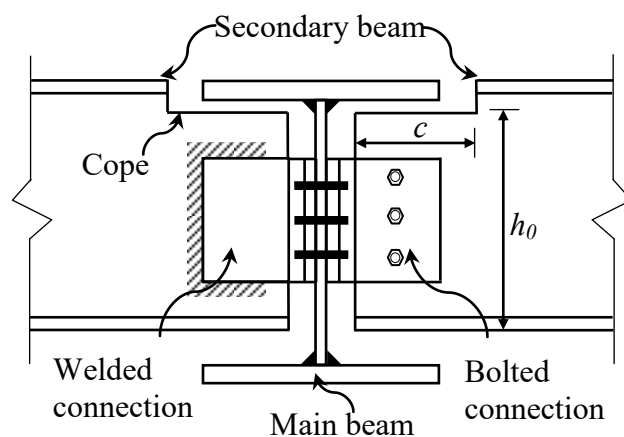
Welded or bolted connection on top flange coped beams
